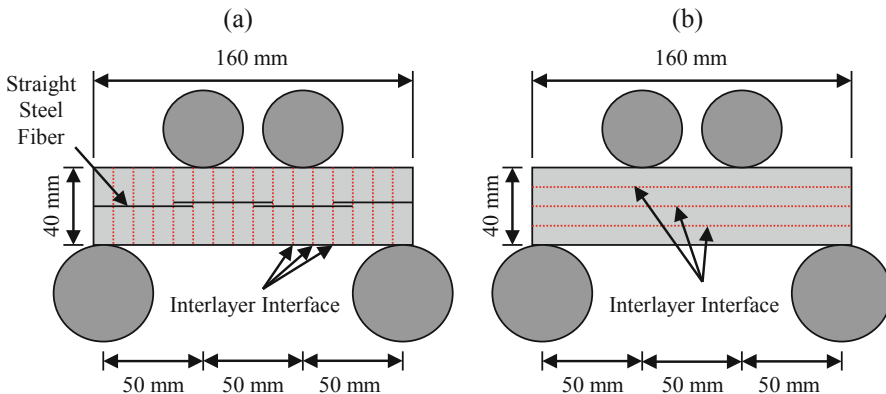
Four-point flexural test schematic (a) printed specimen reinforced with steel fiber orthogonal to the interlayer interface and a parallel applied load; (b) printed specimen containing zero steel fibers with a perpendicular applied load.
